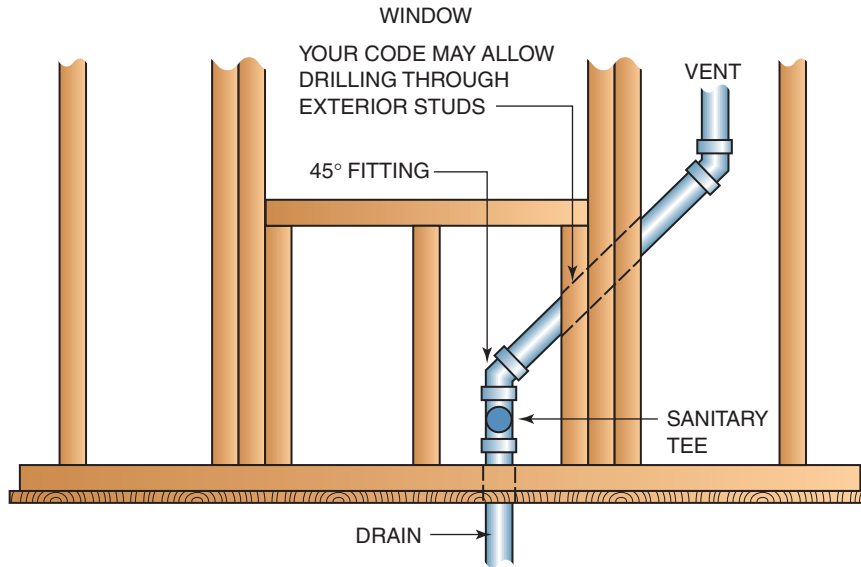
If the exterior load-bearing walls can be drilled based on your local codes, a vent can be routed at a 45° angle into a wall stud cavity adjacent to window.
